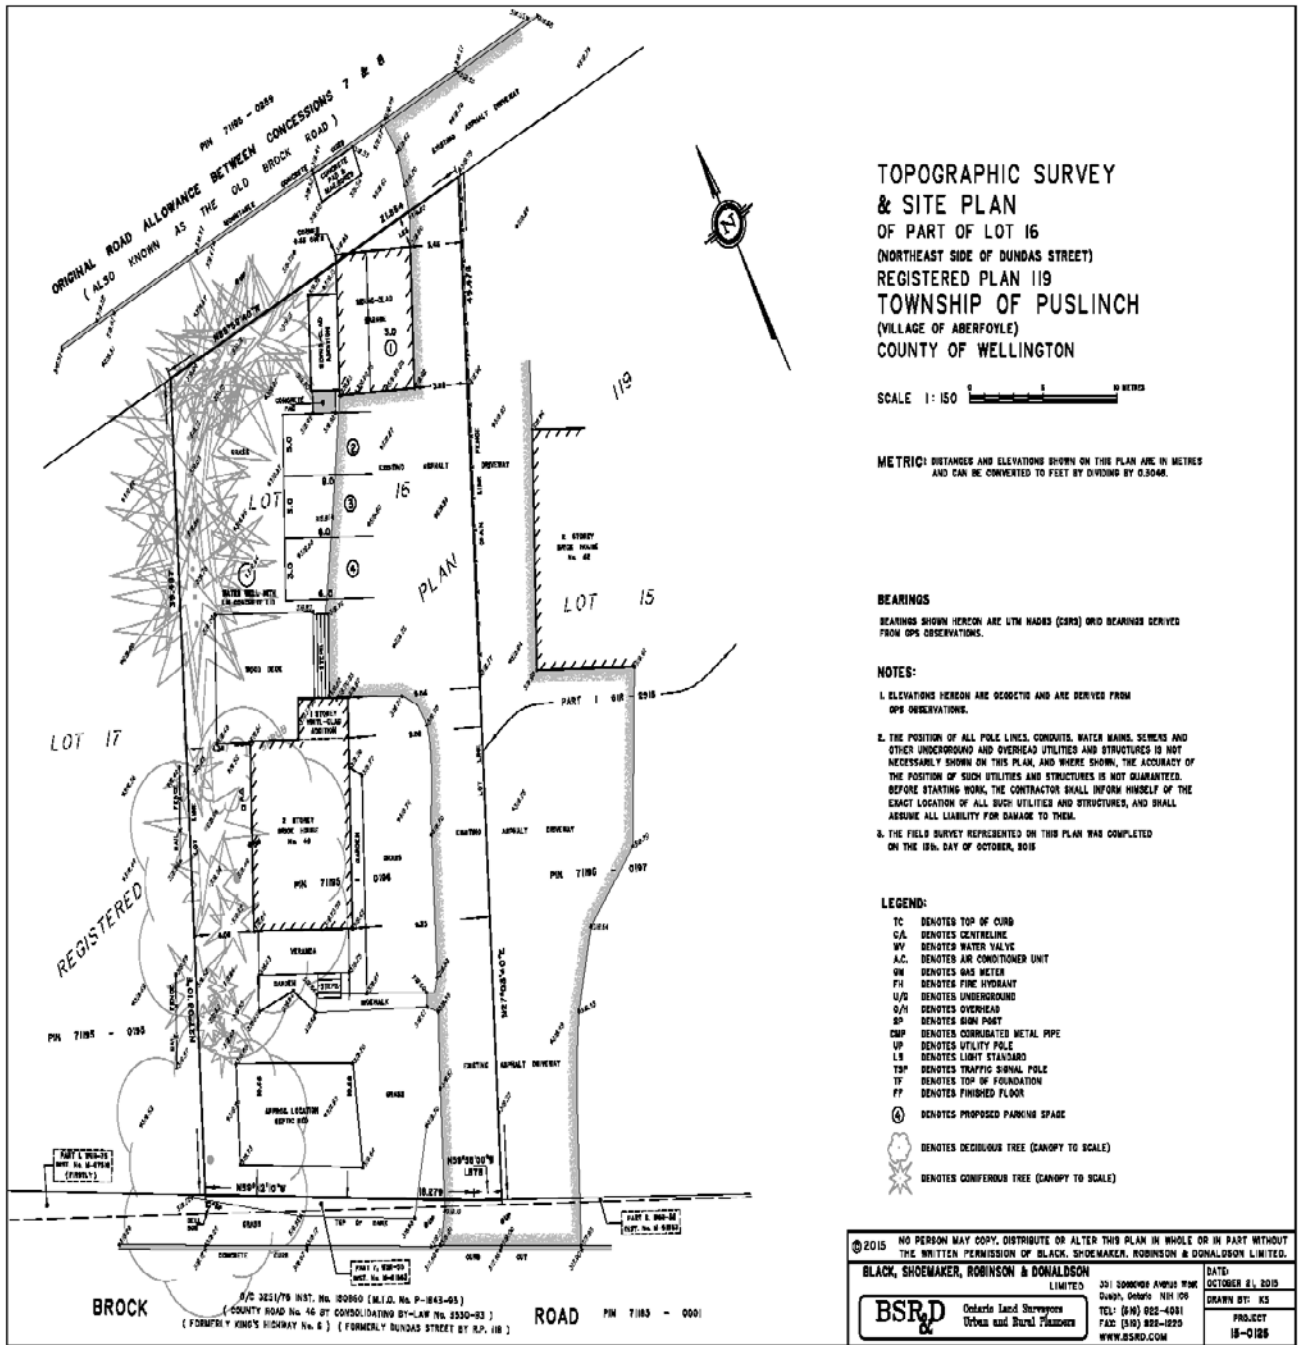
TOPOGRAPHIC SURVEY AND SITE PLAN
